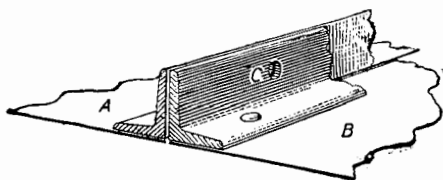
Horizontal Joints by Means of Angle Iron Connections
